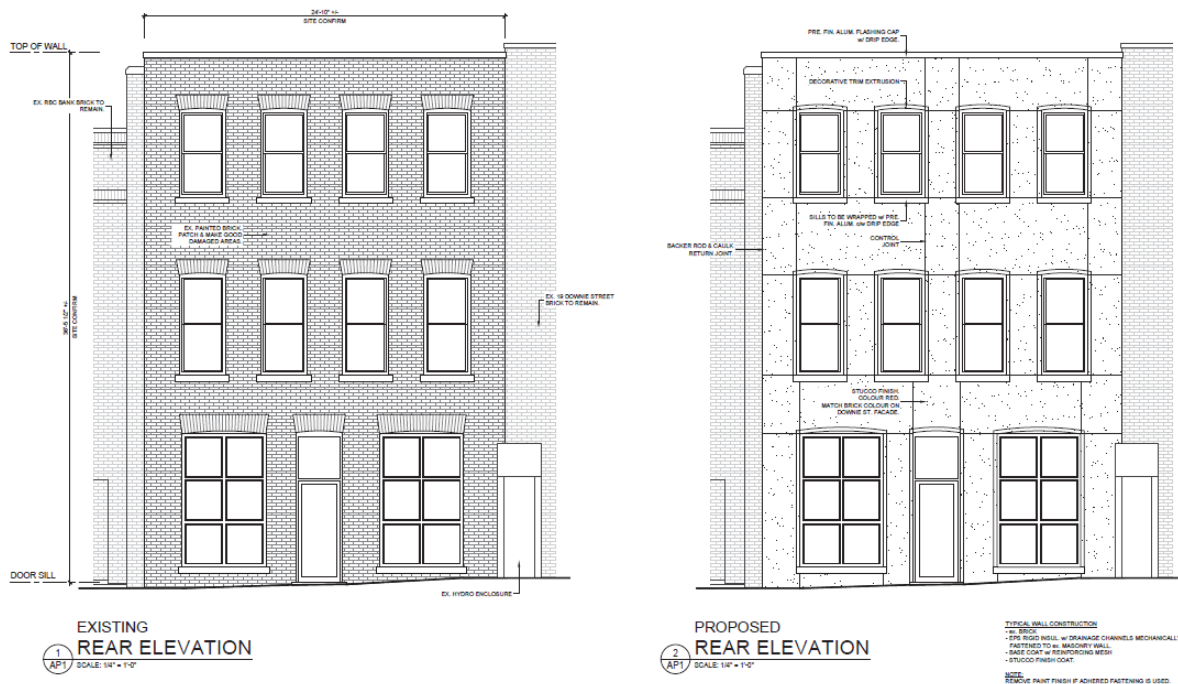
The existing brick façade and proposed EIFS stucco façade.
